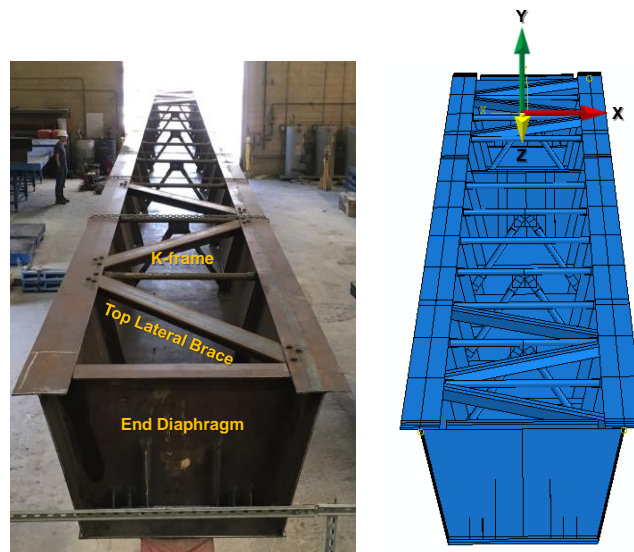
Baseline Tub Girder Specimen and 3D FE Model
